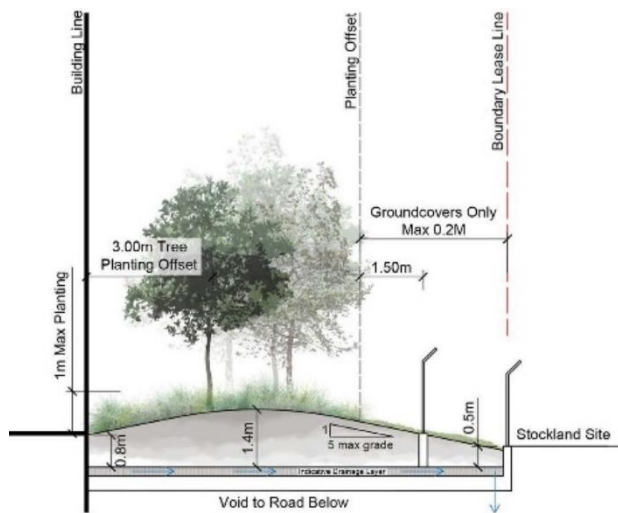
Draft plan showing planting concept on the elevated landscape structure running along the northern edge of the building (Source: AECOM). Refer Appendix C of the EIS
